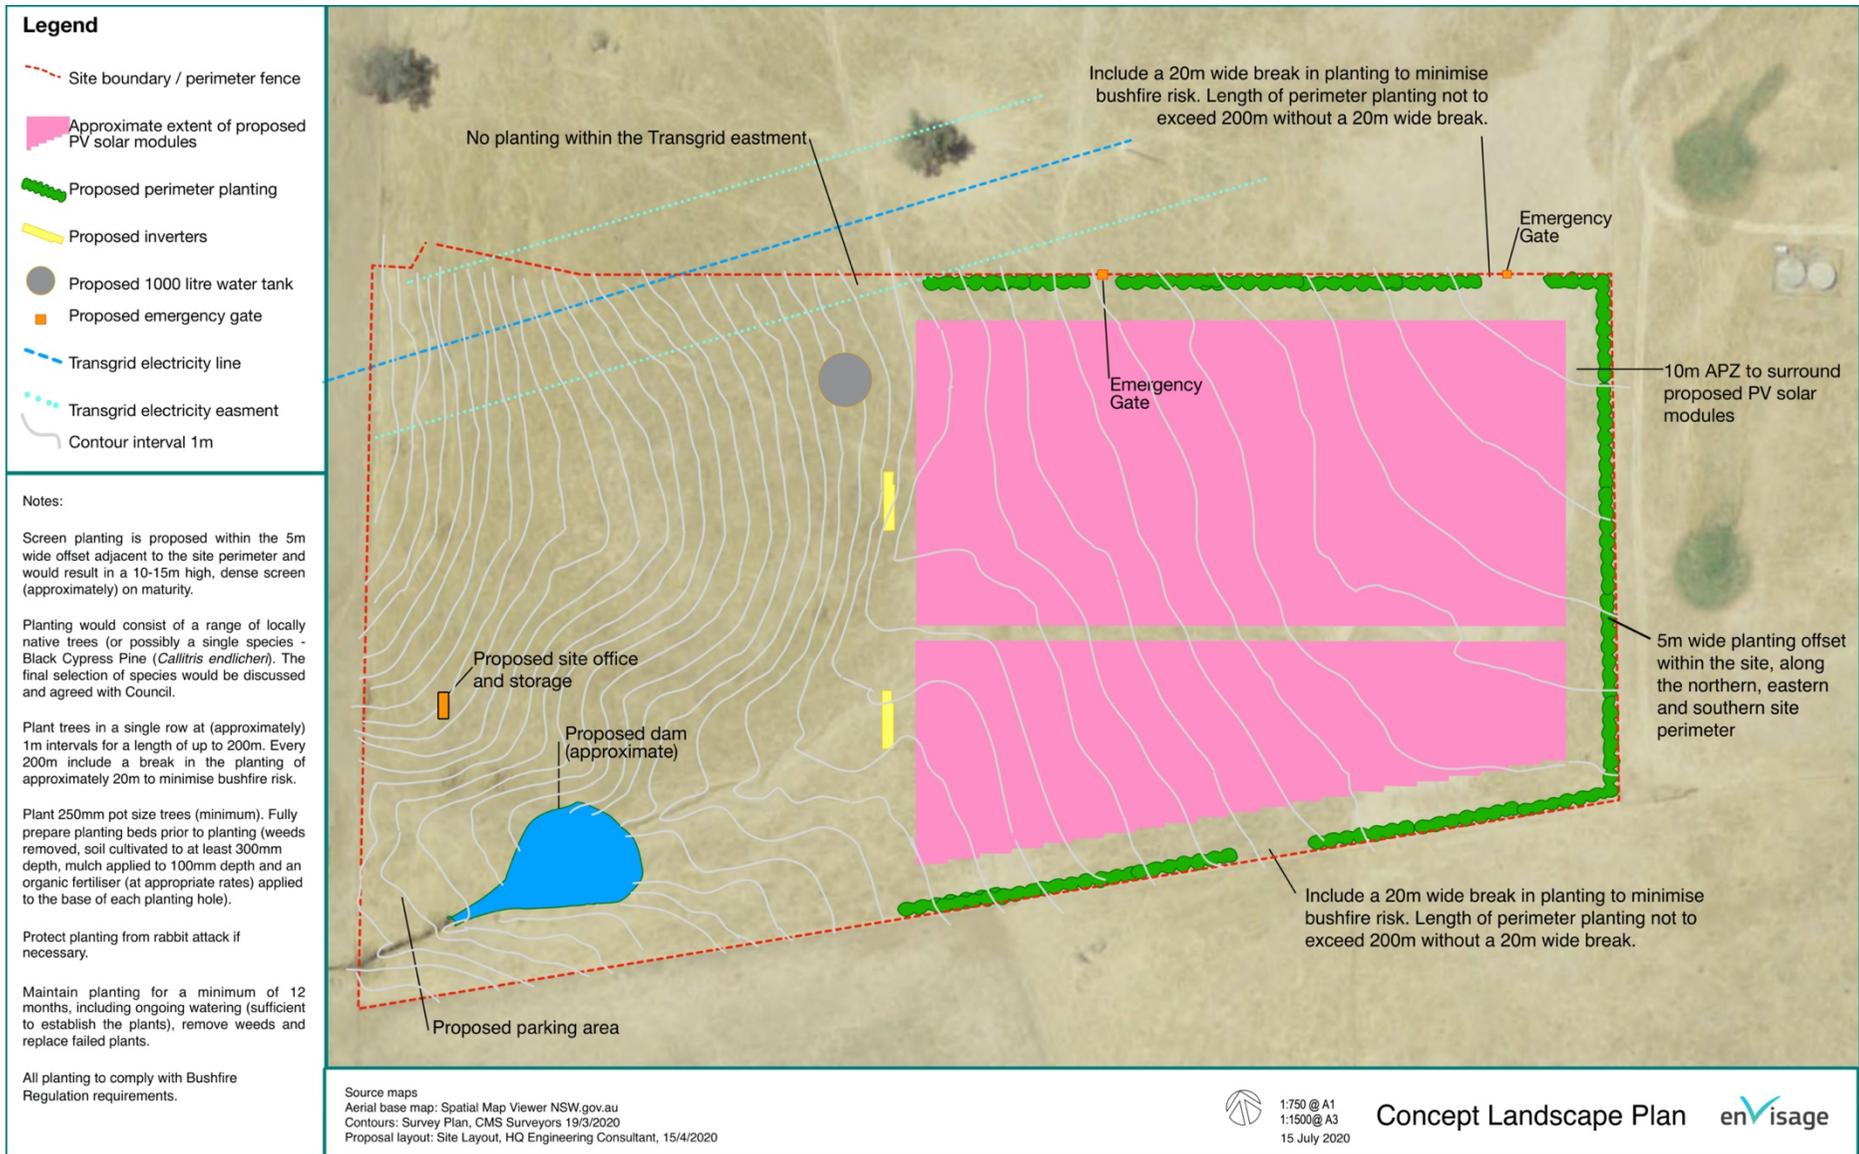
CONCEPT LANDSCAPE PLAN
